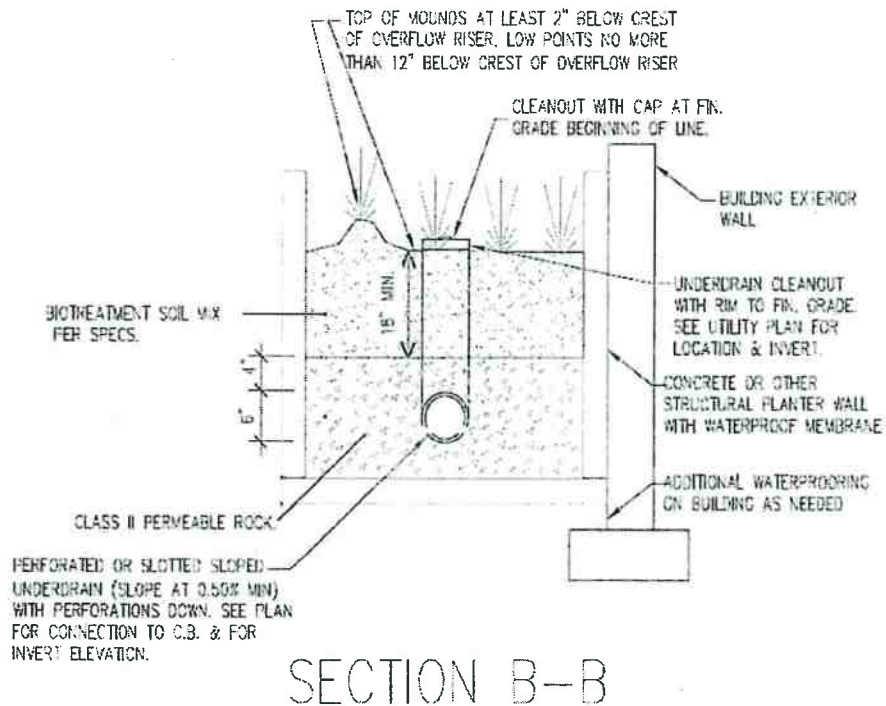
Cross section B-B of flow-through planter, shows cross section of underdrain
